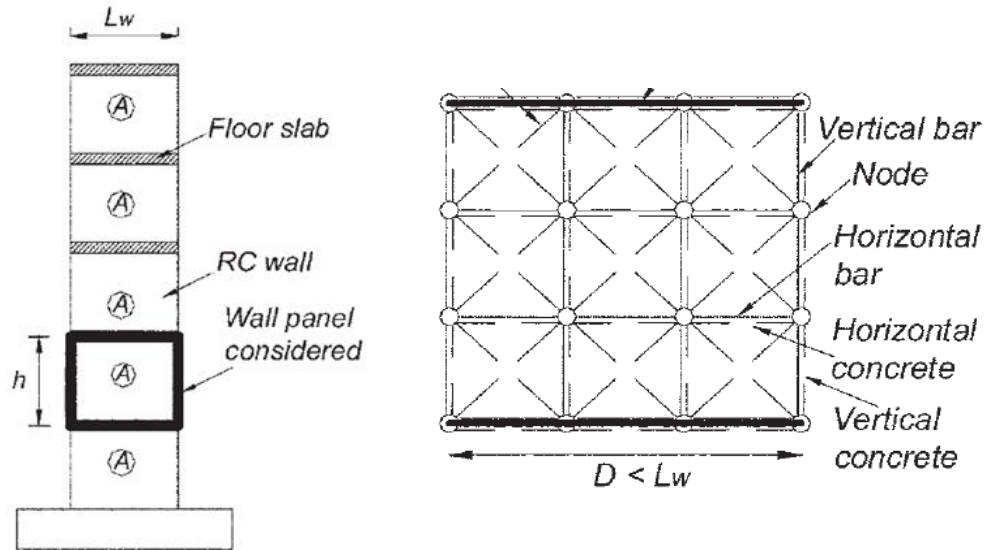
Reinforced Concrete Wall Truss Model. Panagiotou, M., Restrepo, J., Schoettler, M., and Kim, G. (2012), “Nonlinear Cyclic Truss Model for Reinforced Concrete Walls.” ACI Structural Journal: 205–214. Used under fair use, 2014.
